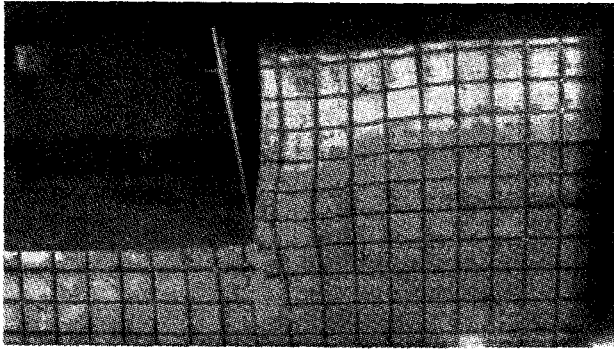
Deformation of the sheet pile wall prior to failure (unpropped). (Test D 4)
